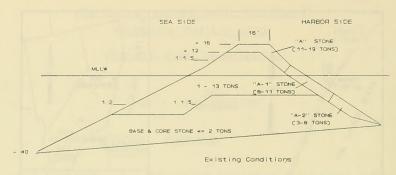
Cross section of existing Redondo Beach King Harbor breakwater
